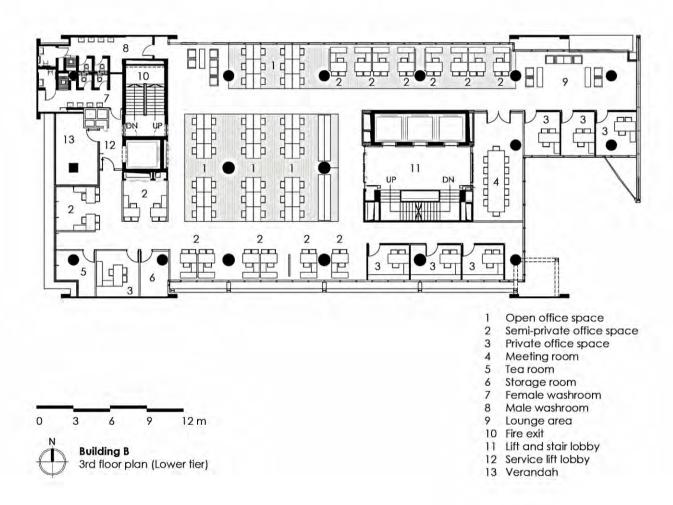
Floor plan of Building B: Lower tier (Source: Building B interior designers, edited by author)
